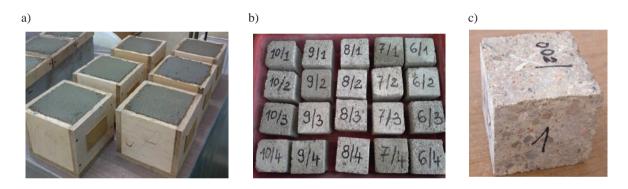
View of a testing specimens: a) moulds of 150x150x150 mm filled with concrete mixtures with the admixture of mineral powders., b) all used in the test specimens b) the specimen of 71x71x71 mm
